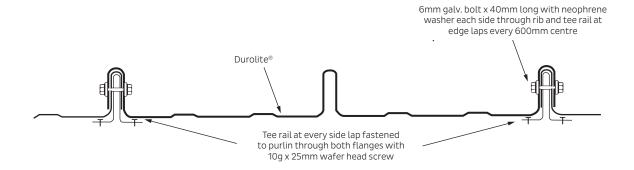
Multiple Durolite® Sheet Detail With Dimondek® 400
